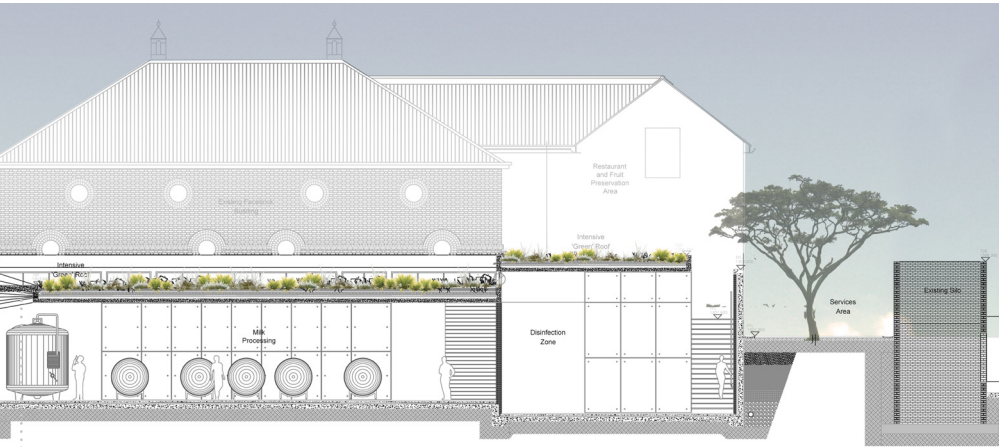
Section elevation through existing silo, 'green' roof and holing yard - not to scale (Author: 2013)
